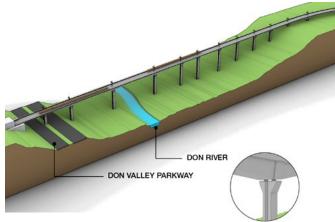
Illustration demonstrating elevated rail going through ravine and natural area, Ontario Line (Photo Credit: Metrolinx)
